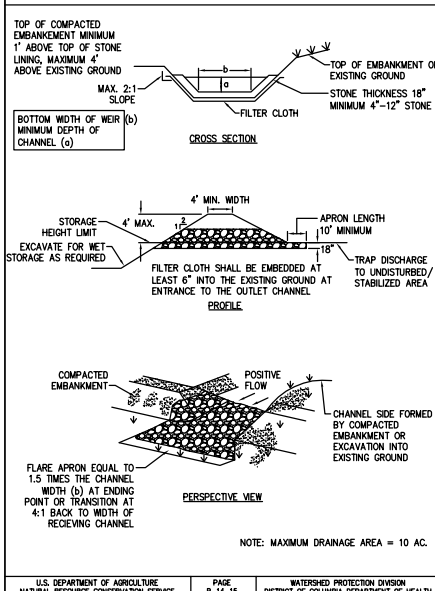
STONE OUTLET SEDIMENT TRAP - ST II
